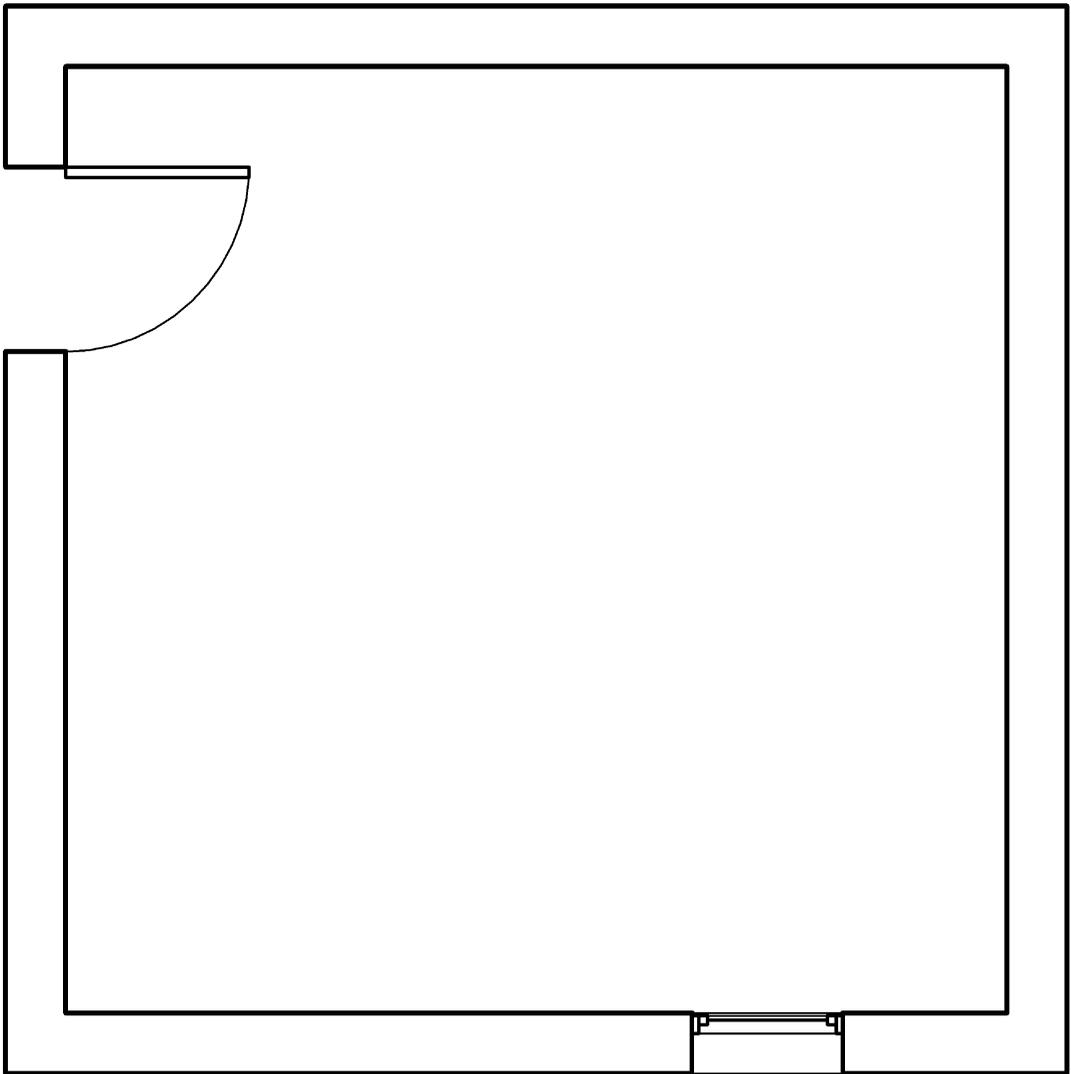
Floor plan of a model in BIM, comprising four walls, a door and a window
